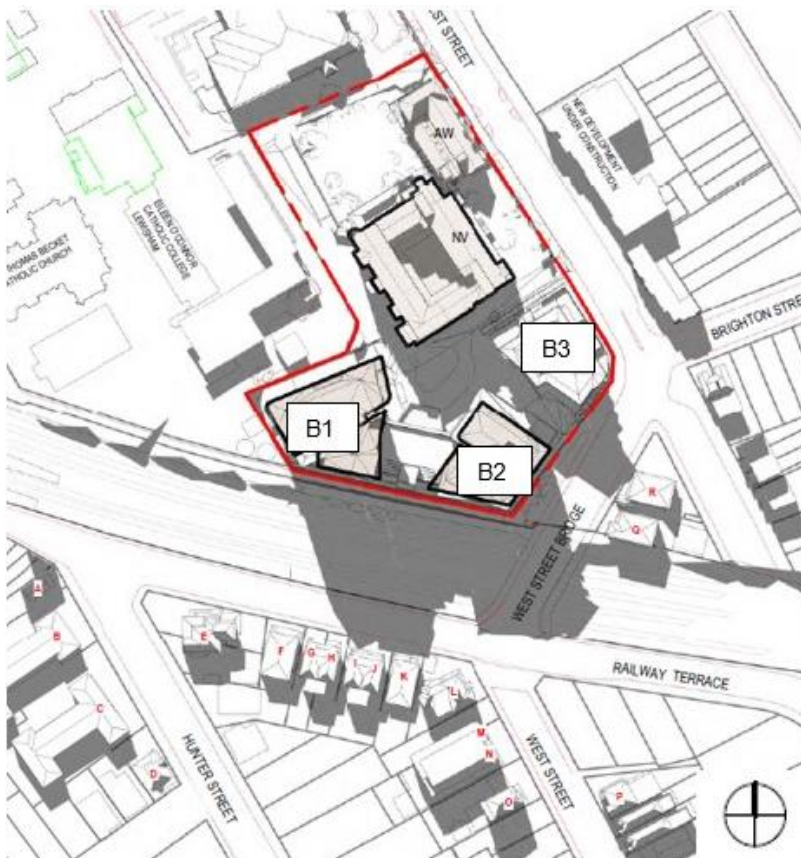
Shadow Diagram at 9am on 21 June (Source: Jackson Teece Architectural Plans)
